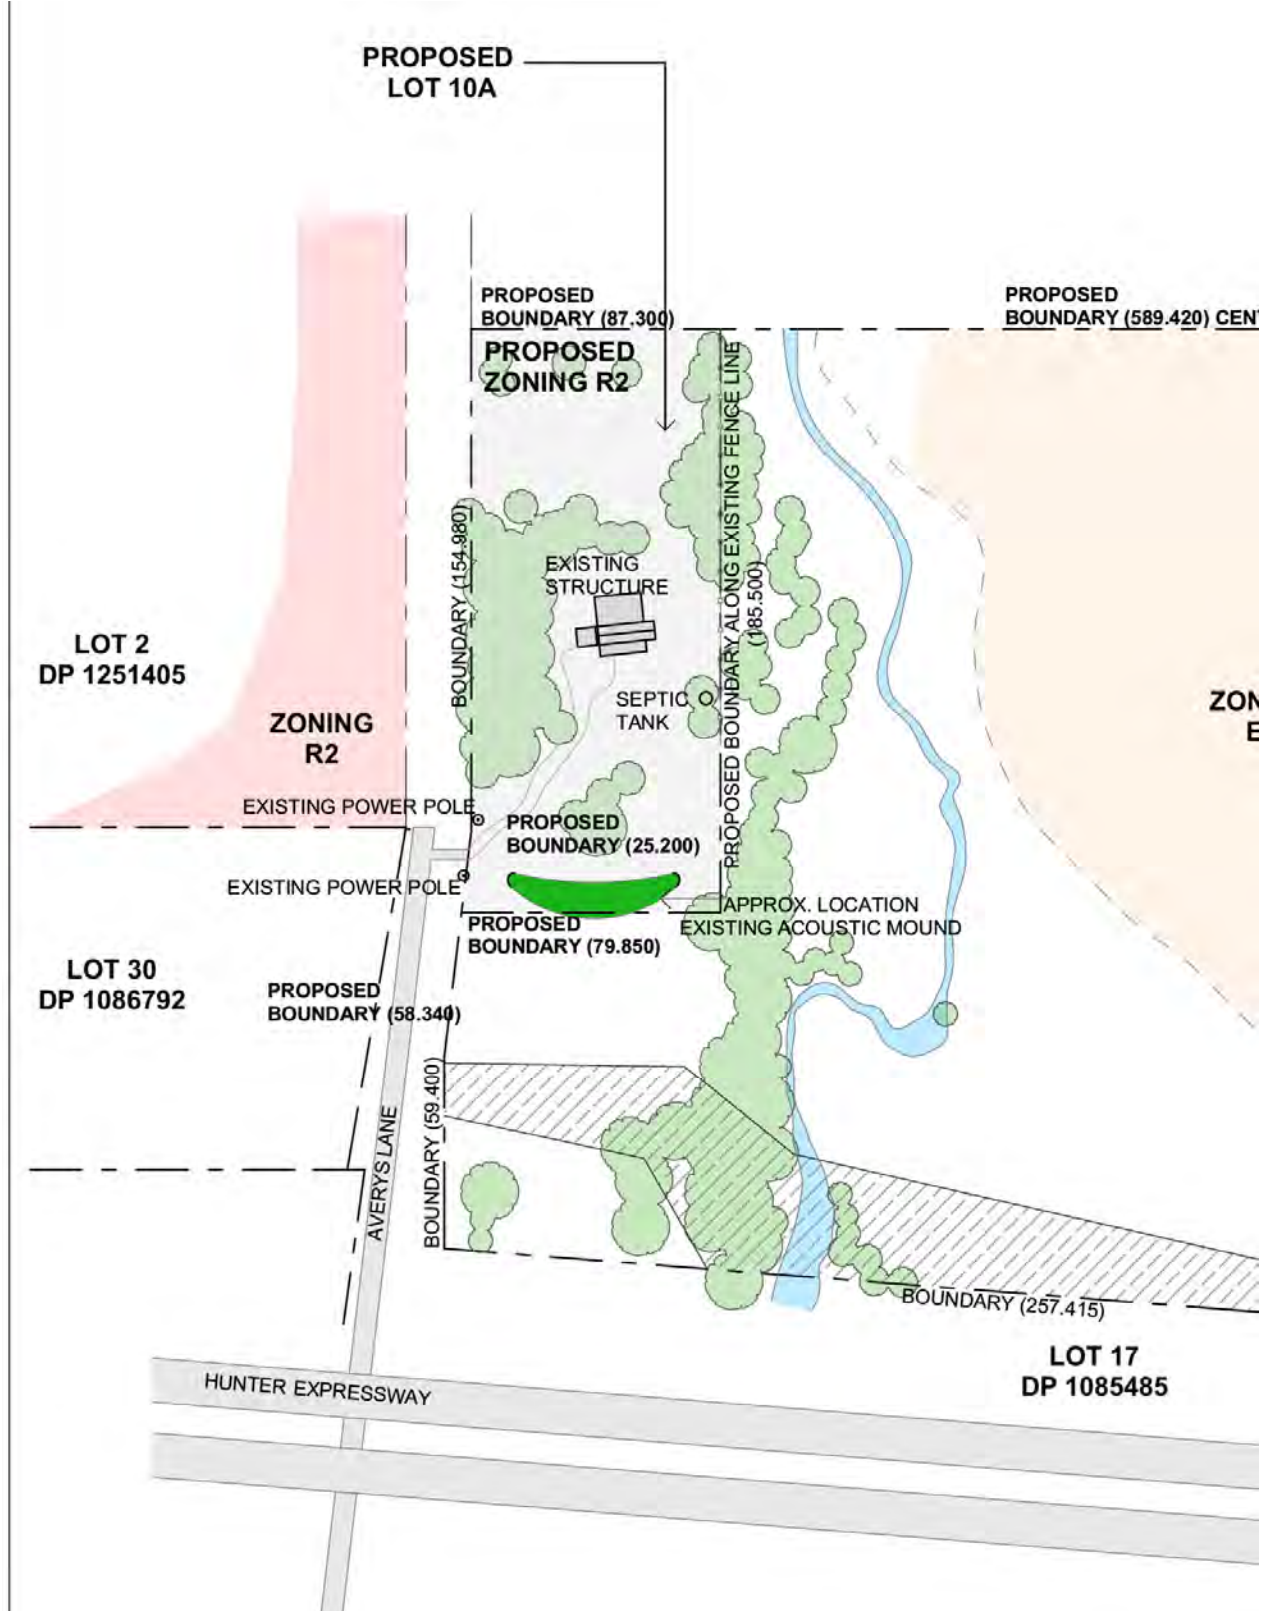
Potential Subdivision plan (from Complete Planning Solutions, undated)
